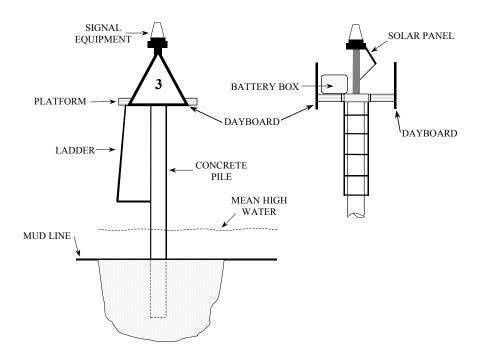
Single Pile Concrete Structure (Lighted)
